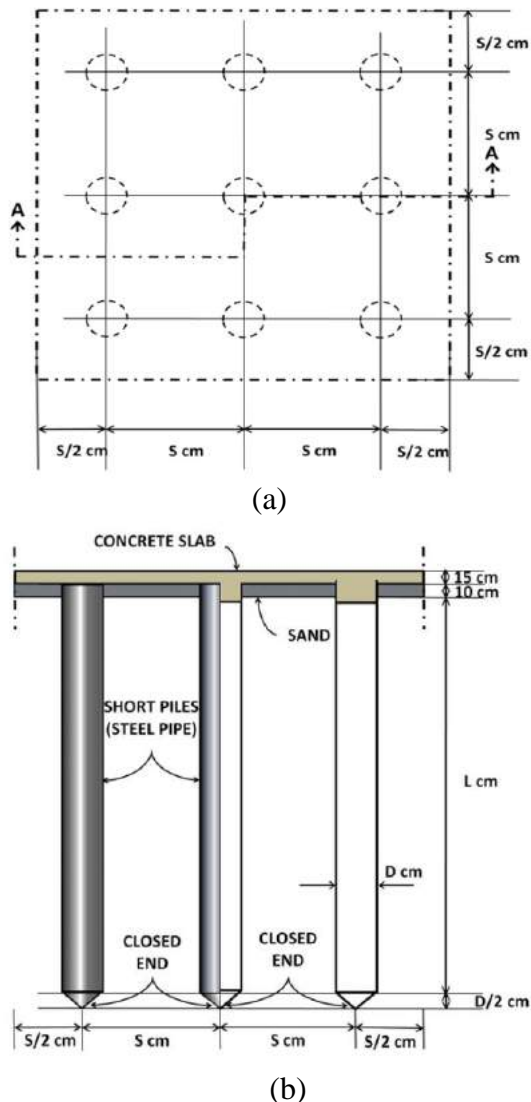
SPR Foundation System; (a) General Plan; (b) Cross Section A-A.
